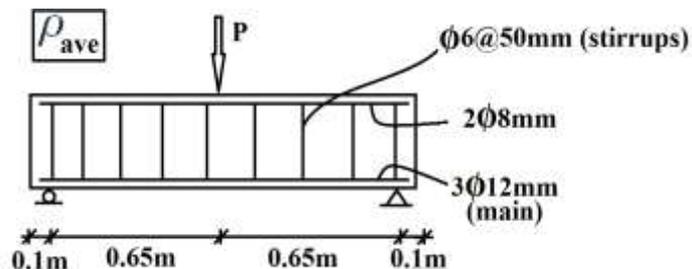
Reinforcement, geometry and loading of the beam 1P-ave
